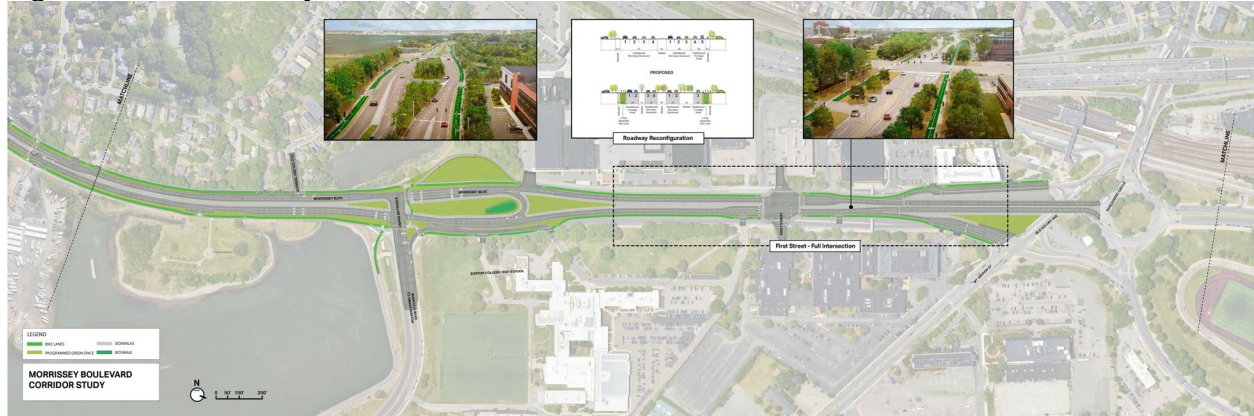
Corridor Layout from Columbia Road to Preble Street
